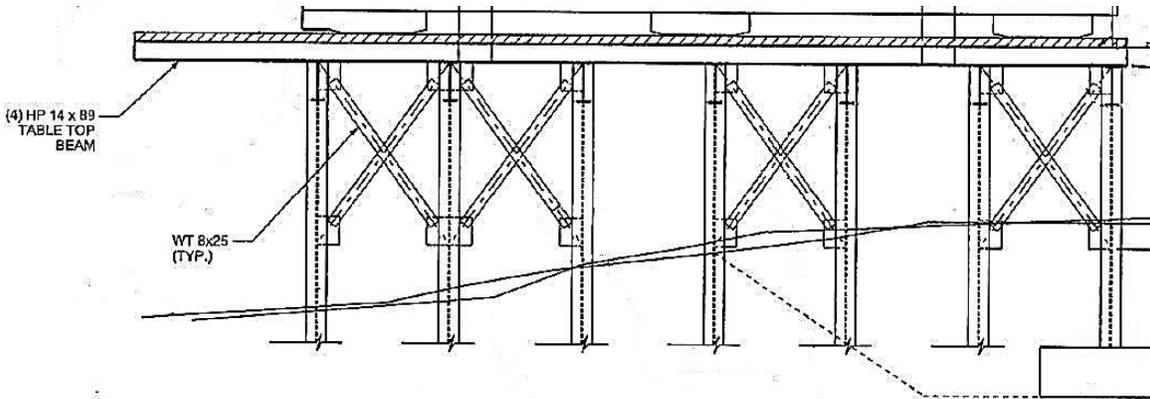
Side view of the I-80 at Wanship temporary substructure for the EB bridge
